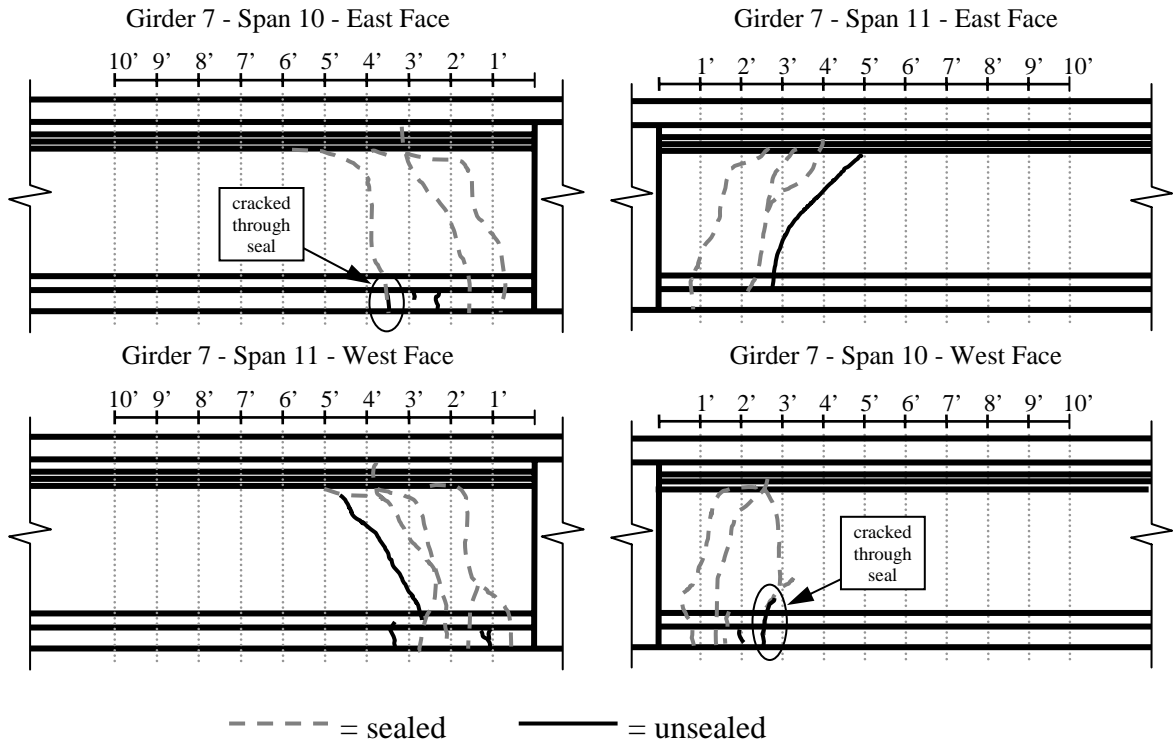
Girder Line 7 Cracking (Fason and Barnes 2004)
